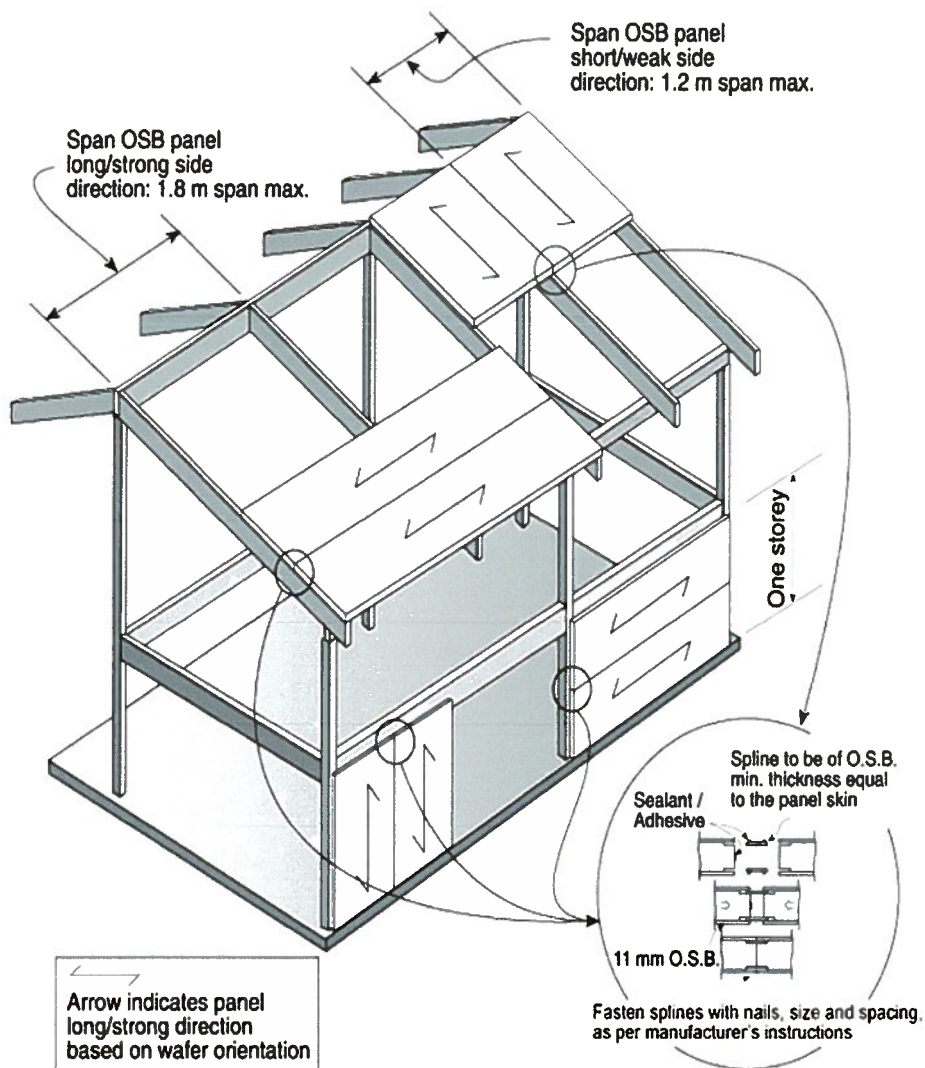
"Insulspan SIP System" – non-axially loaded structural panels with OSB splines on post-and-beam frame with limited roof spans of 1.2 m in OSB weak direction and 1.8 m in OSB strong direction. See manufacturer's panel-to-structure fastening details.
